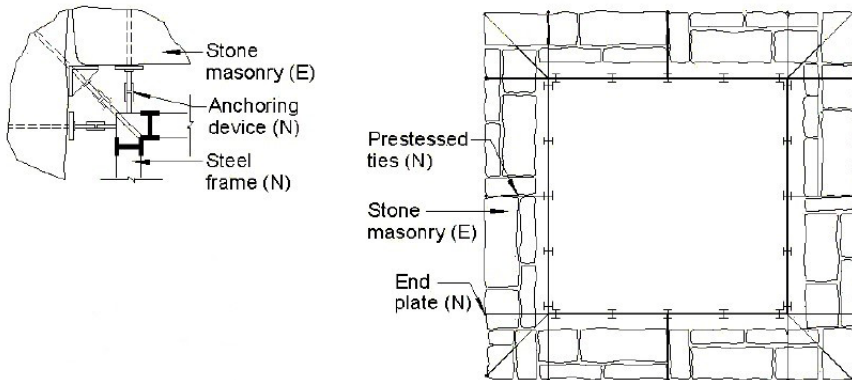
The plan and details of a masonry tower, featuring the incorporation of a steel frame and prestressed ties (Chidiac & Foo, 2017).
